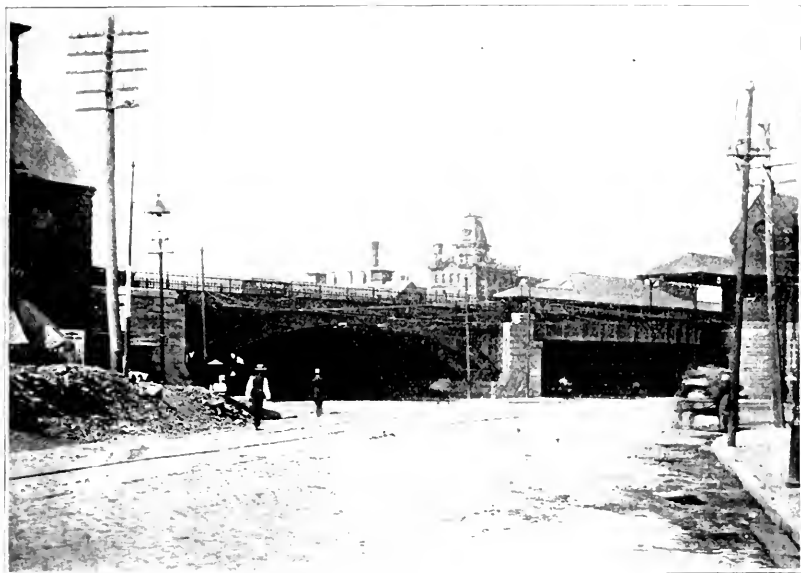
TREMONT STREET STEEL ARCH AND DRIVEWAY BRIDGE, ROXBURY.
